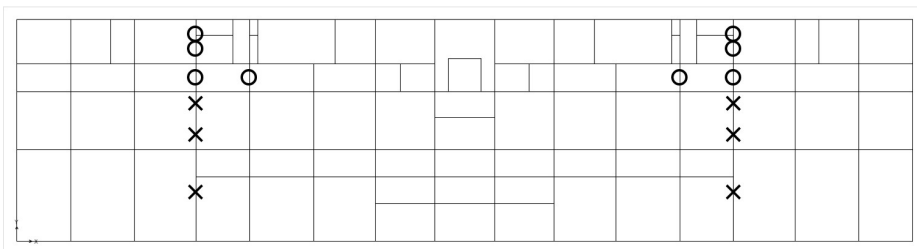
Damper Placement at 4th floor (SR-Y); MSSSA: 8 dampers;
